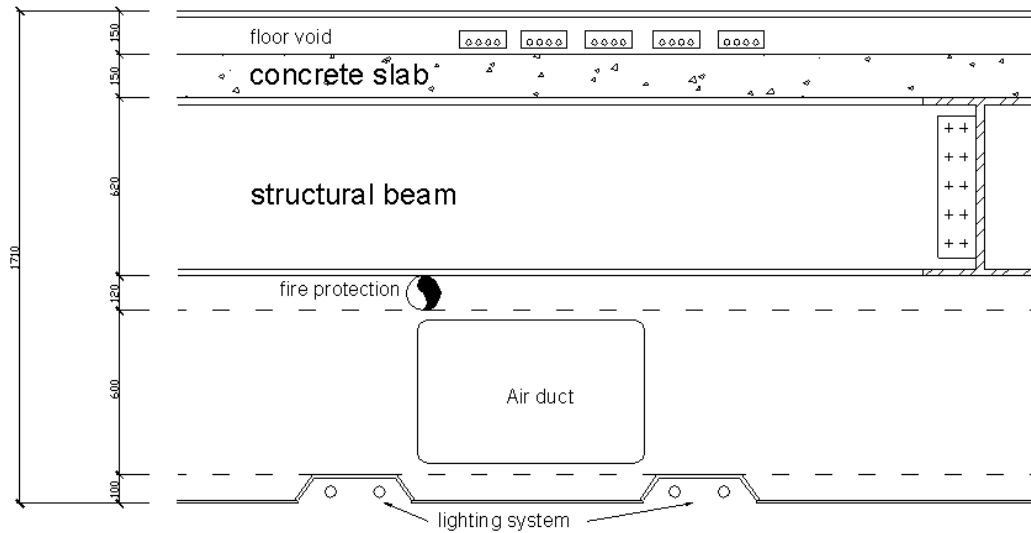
Ceiling and floor voids of a ceiling-based HVAC system
